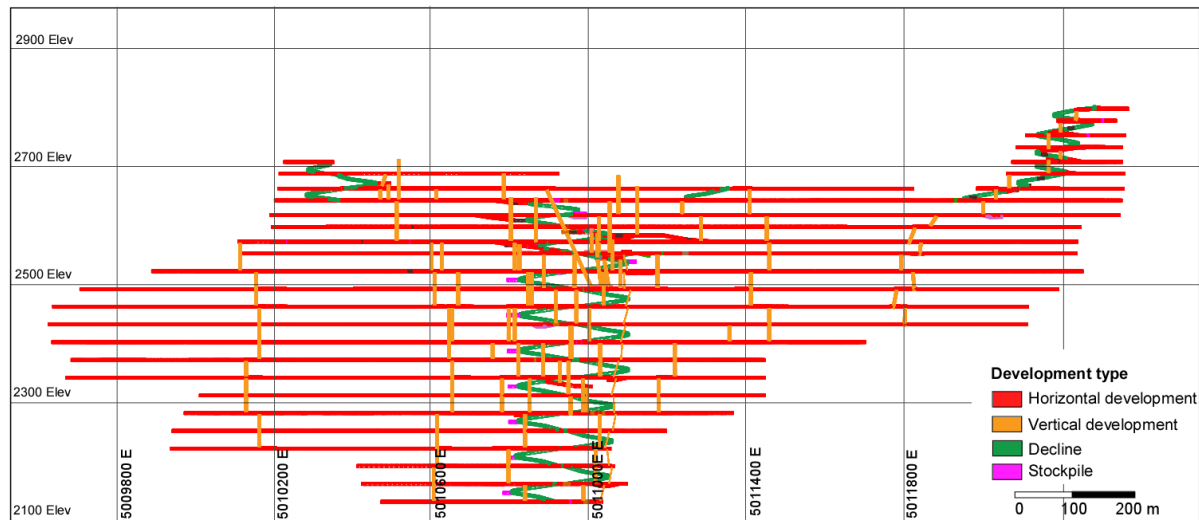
Long section of mine design - Source Aris Mining 2025
